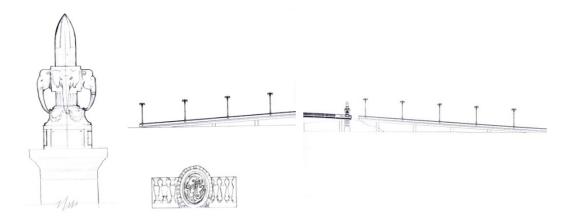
Chaloerm-La 56 bridge (source: Architectural drawings of historic places in Thailand, 2008)
